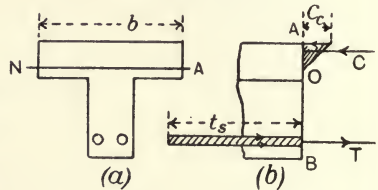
Reinforced concrete T beam, NA within the slab.
